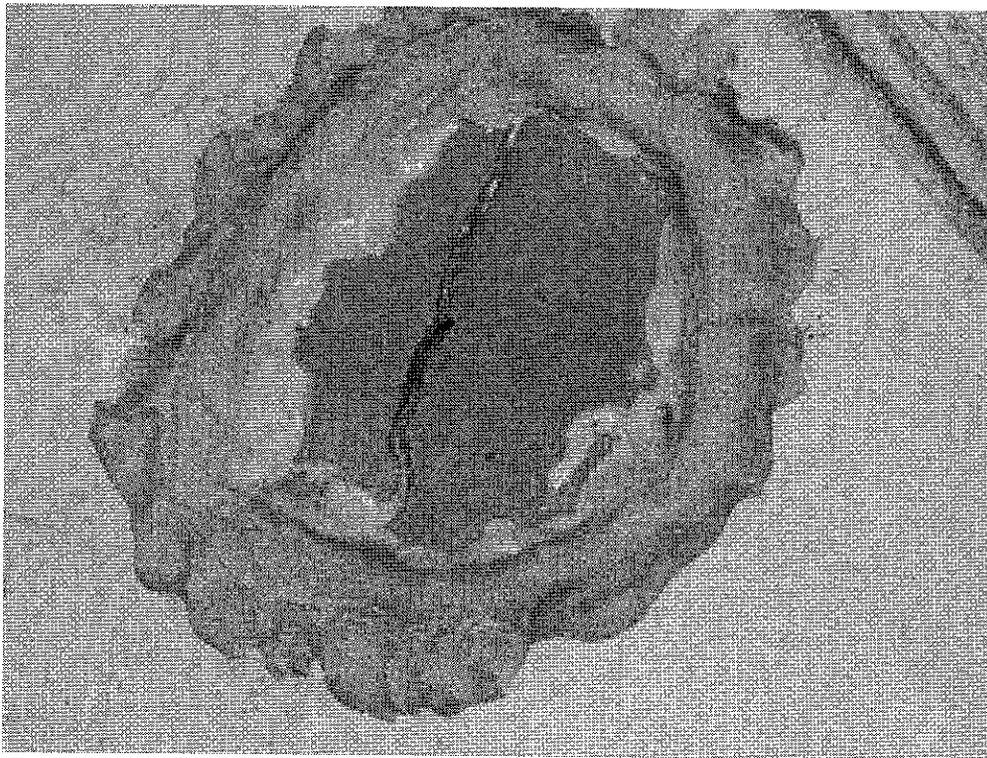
Close-up view of pour test in clay basin, just southwest of sink/drain area. Again, open crack, where water fell through crack, is visible on lower side of photo.
